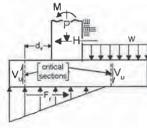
Example of Critical Section for Shear in Footings
